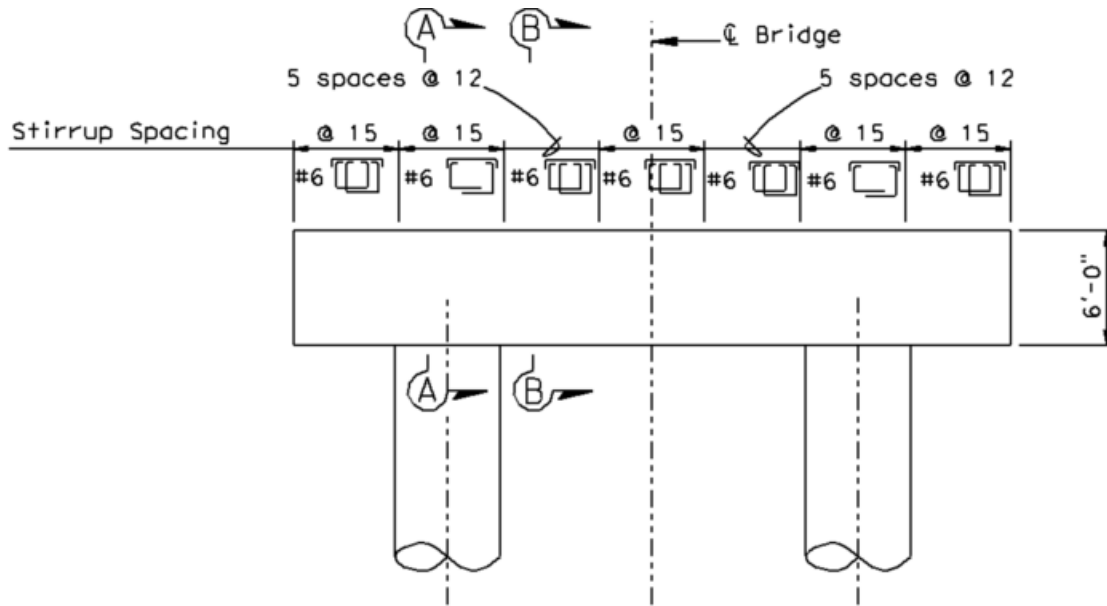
Elevation of Drop Cap Showing Stirrup Spacing
